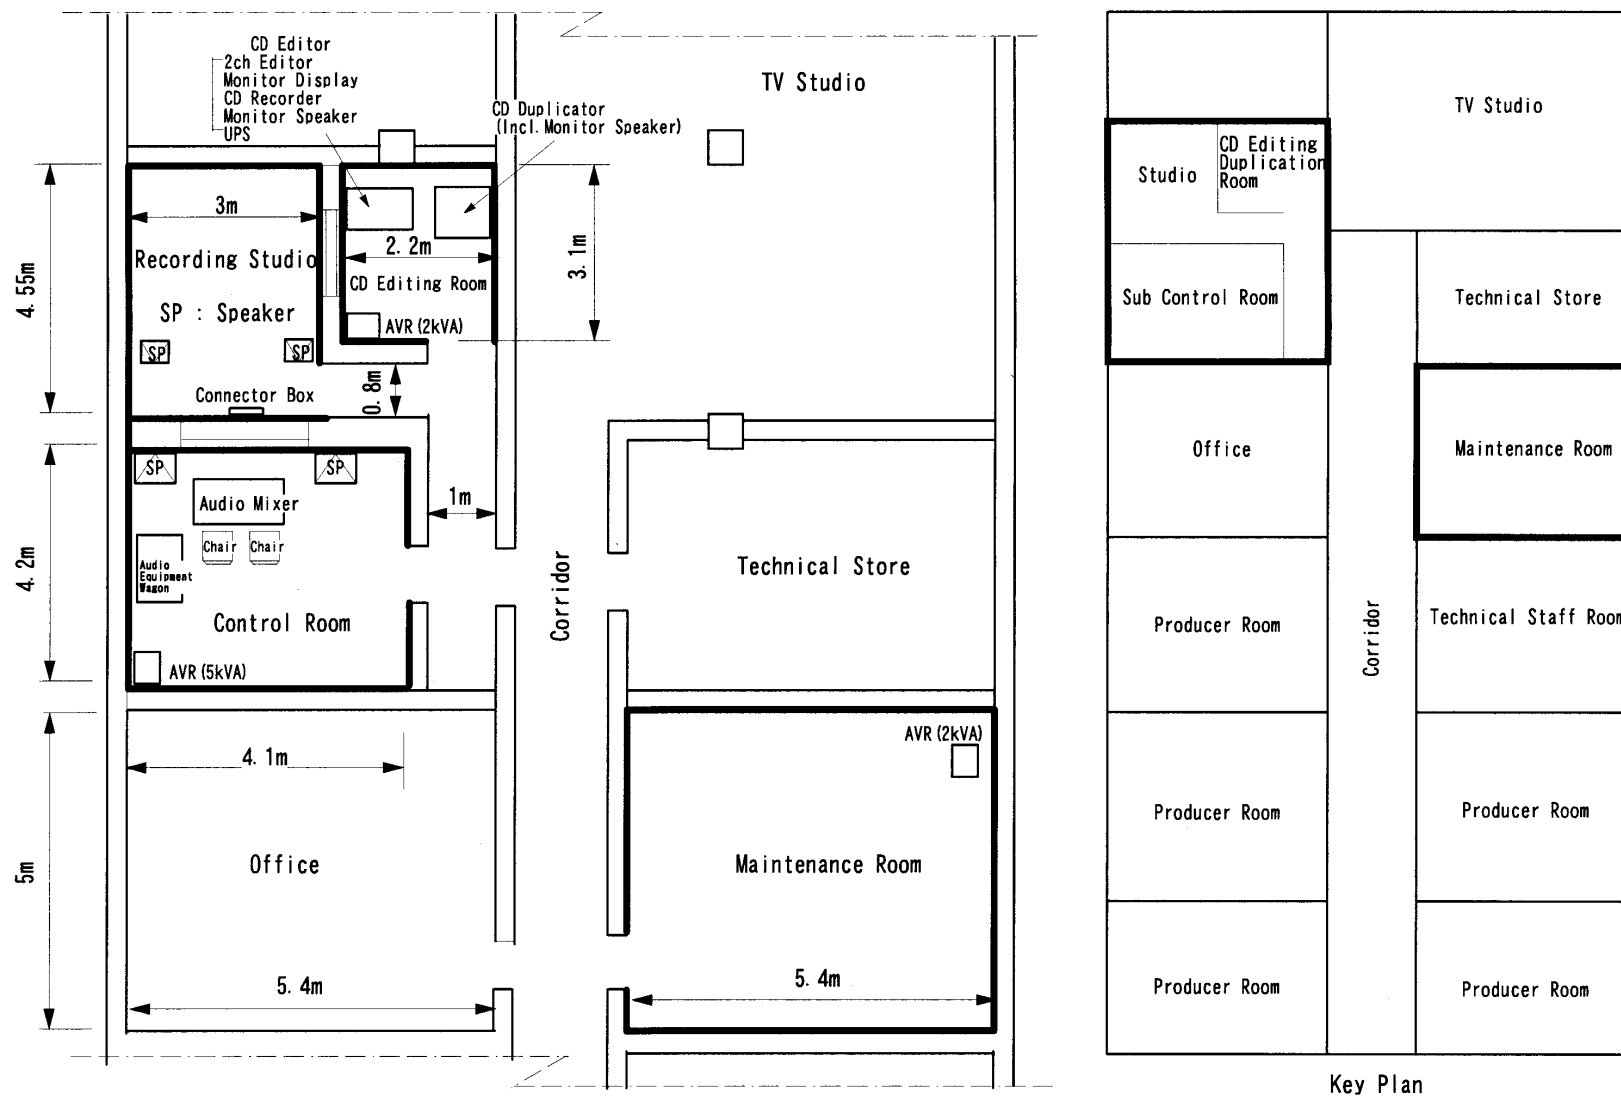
Floor Layout of Harar in Harari Radio Studio
